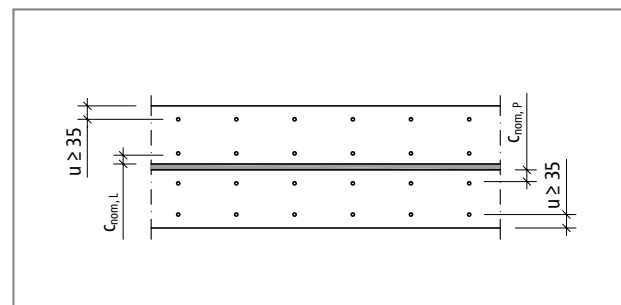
Schöck Tronsole® type F: Vertical section transverse to the stairs in the area of the corbel support; depiction of the concrete cover $c_{nom,L}$, $c_{nom,P}$ and the minimum centre-to-centre distance u of the reinforcement
